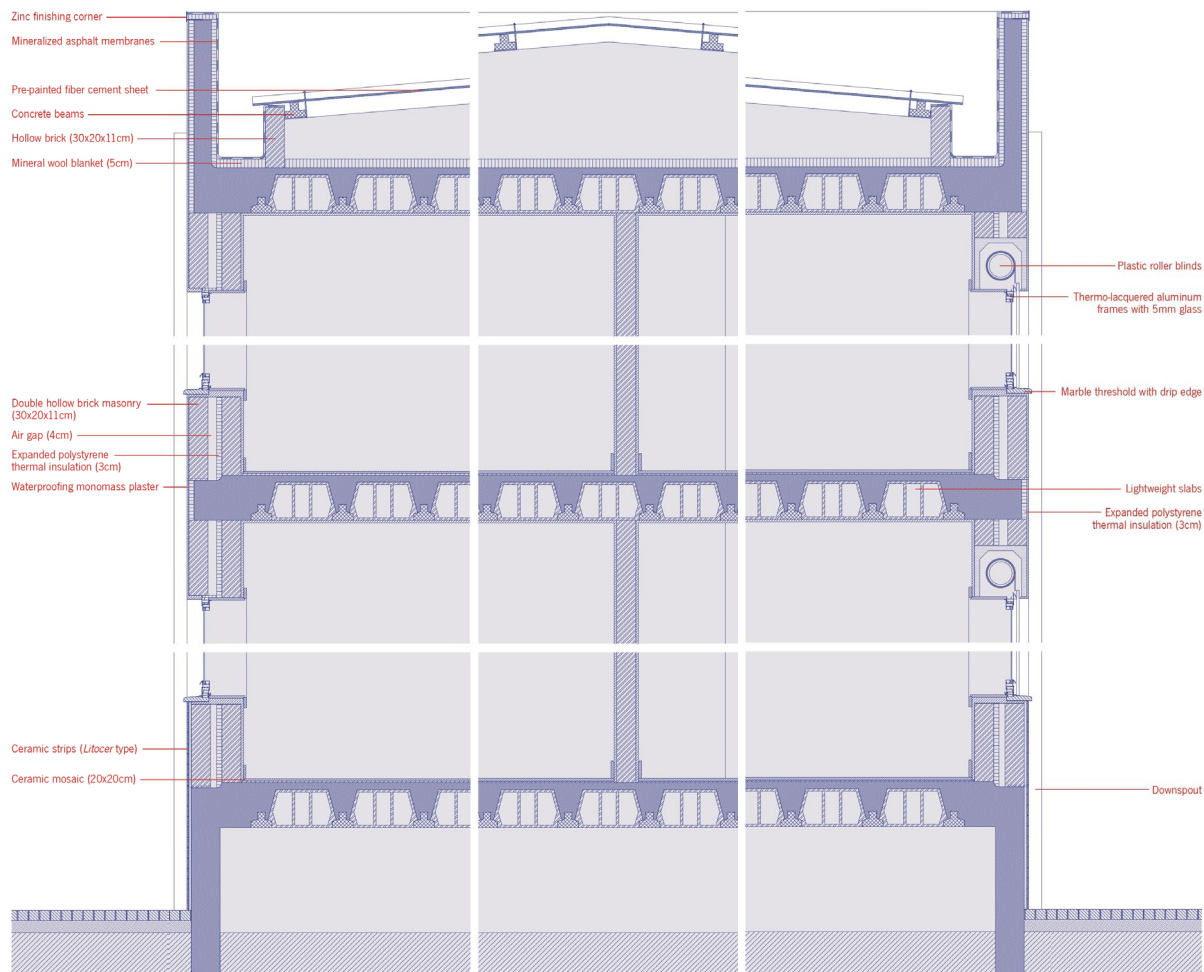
Detail section of the building envelope of 3 de Julho Social Housing.
